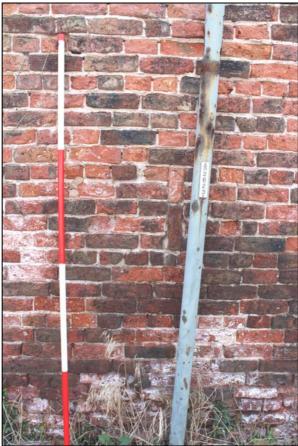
, 61: View of the brickwork between the barn left (Blg. B, and the house right (Blg. A2), looking southwest
